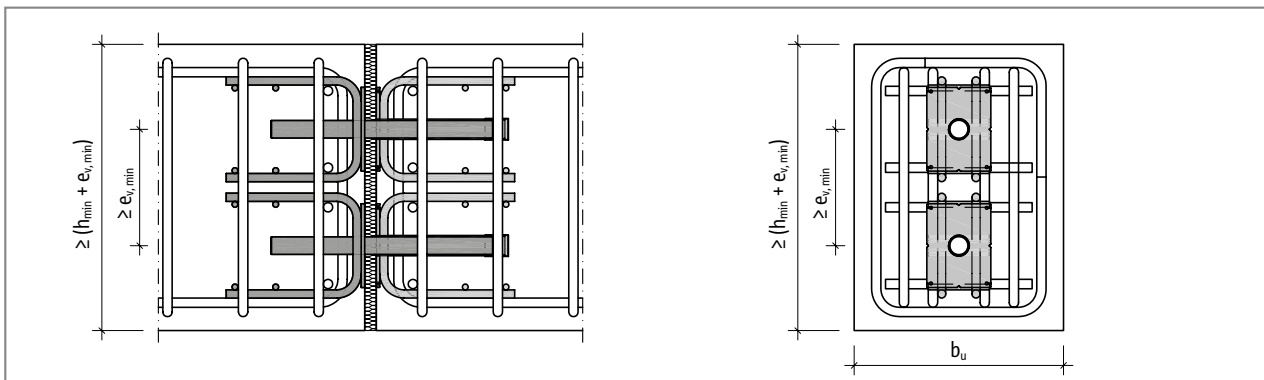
Schöck Dorn type SLD: On-site reinforcement for beam connection
